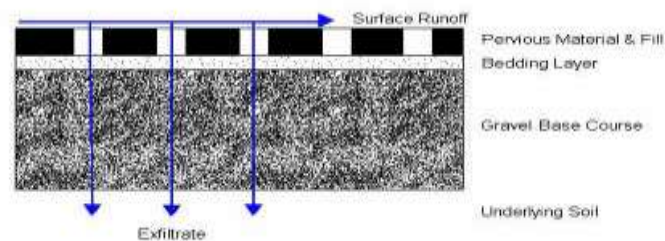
cross section of a typical block paver permeable pavement installation without under drains
